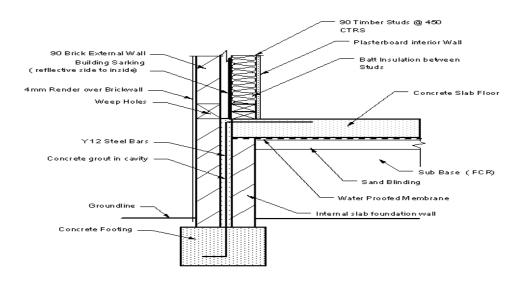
Construction detail of the concrete slab-on-ground floored case study house depicting the perimeter wall detail
